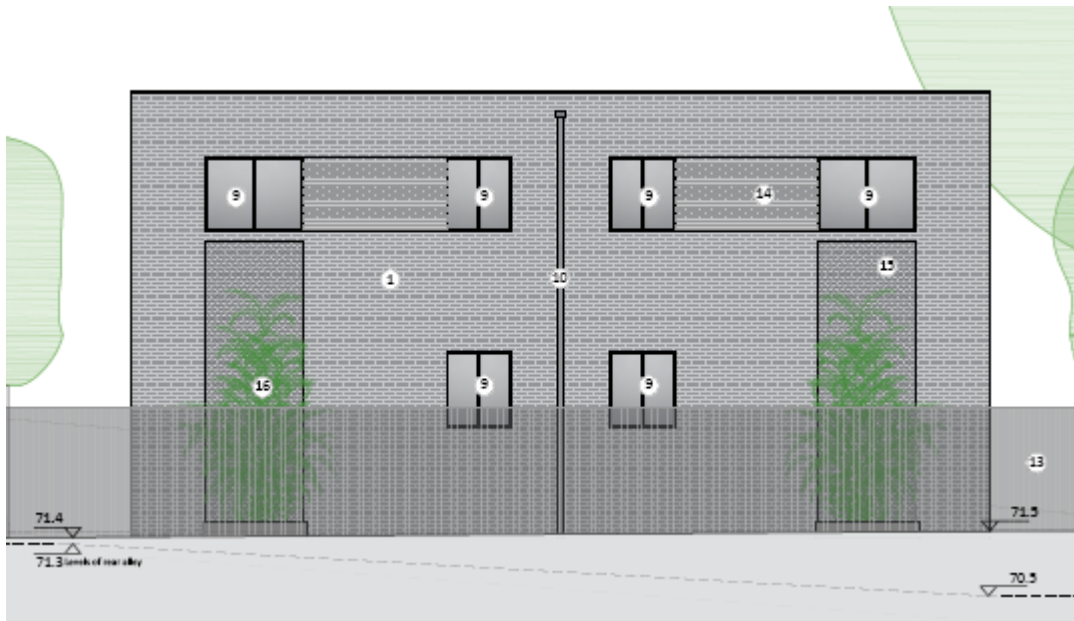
Amended rear elevation – Block A. All rear windows to be obscurely glazed.
